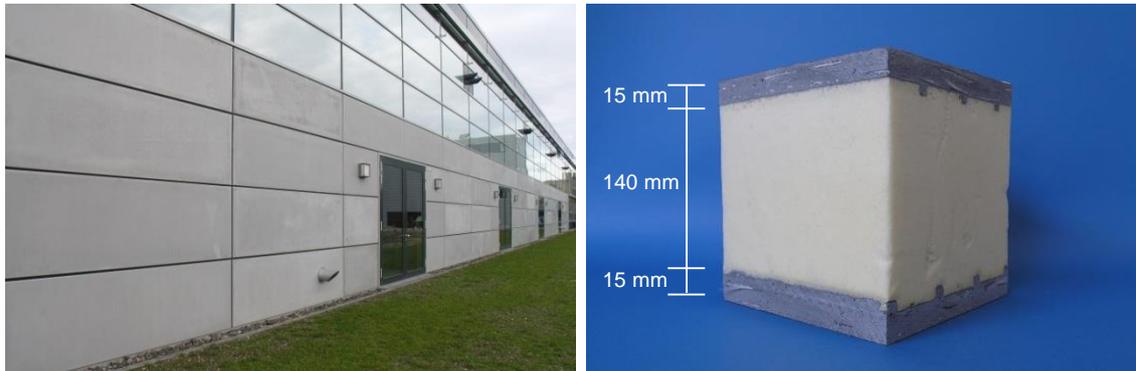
Façade of Innotech building (left exterior view, right cross section of sandwich structure)
